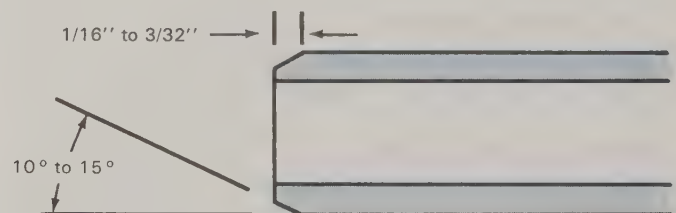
For easier assembly of fittings to pipe, the cut end of the pipe should be beveled as shown. The bevel will also help prevent scraping of solvent from the fitting socket when the pipe is inserted. (Nibco)
